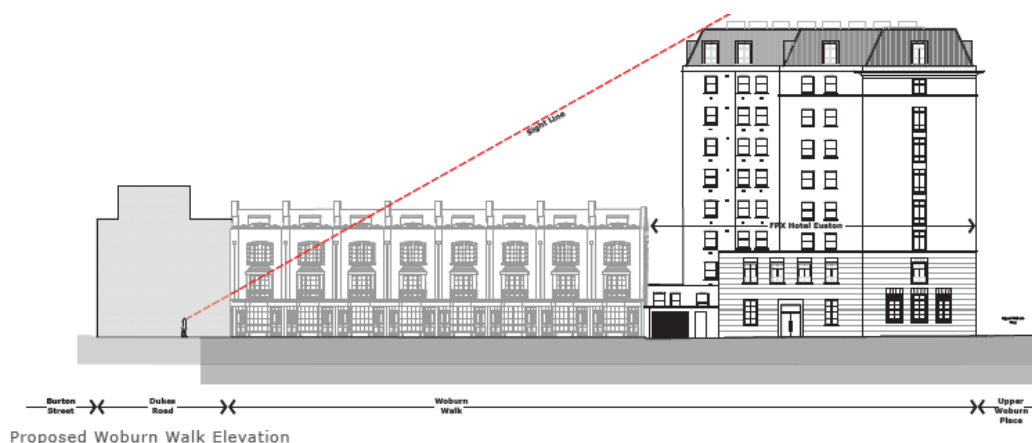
Proposed sight line of roof extensions from Woburn Walk
